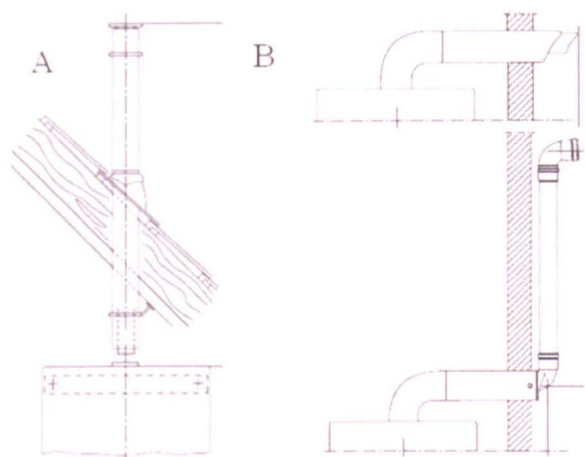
Roof installation and wall installation of boiler flue pipe (A. Roof installation; B. Wall installation.)
